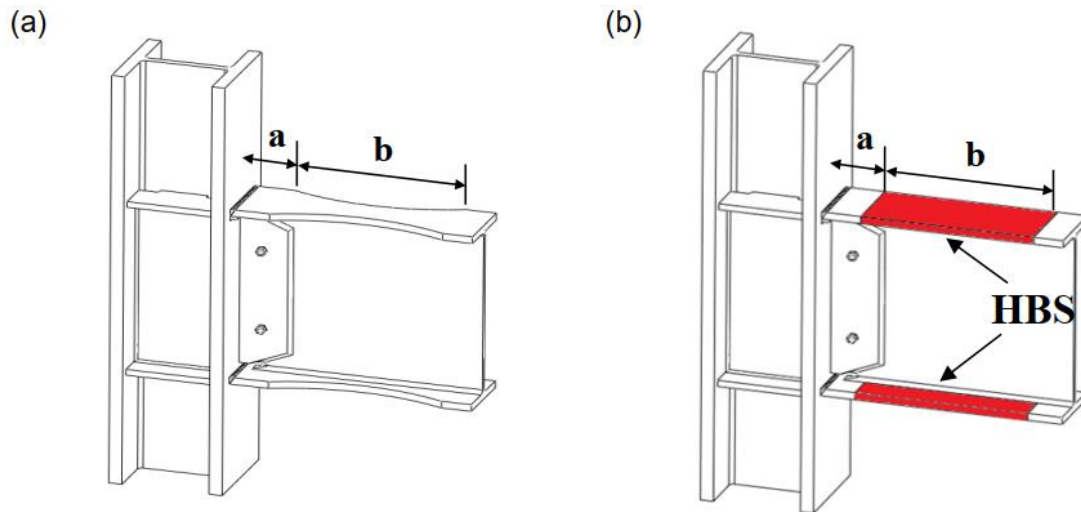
Sketch of (a) Reduced Beam Section (RBS) and (b) Heat-treated Beam Section (HBS)[8]
